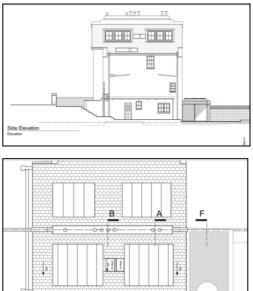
Proposed roof plan and side elevation at no.14 Provost Road showing the dormers to the side roof slope.
